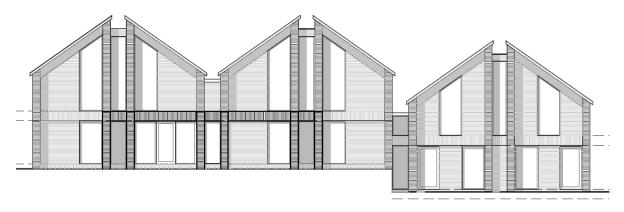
Proposed front elevation (facing Dee Banks Road)
